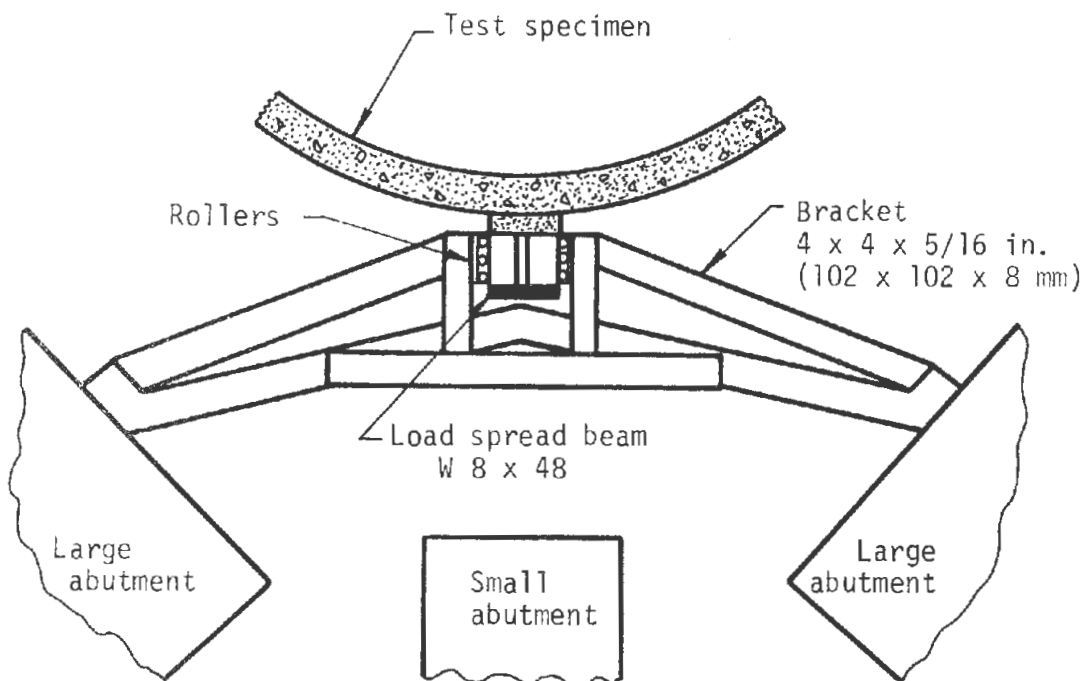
BRACKETS LOCATED AT THE NORTH, SOUTH, EAST AND WEST SECTIONS TO PREVENT RIGID-BODY MOTION OF THE SPECIMEN
